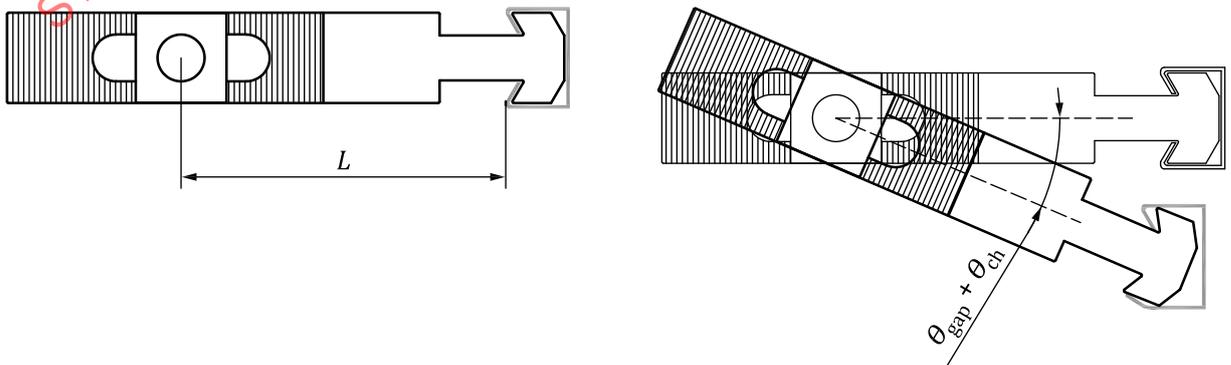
Failure mechanism of the hammer-head strap connection with weak channels
